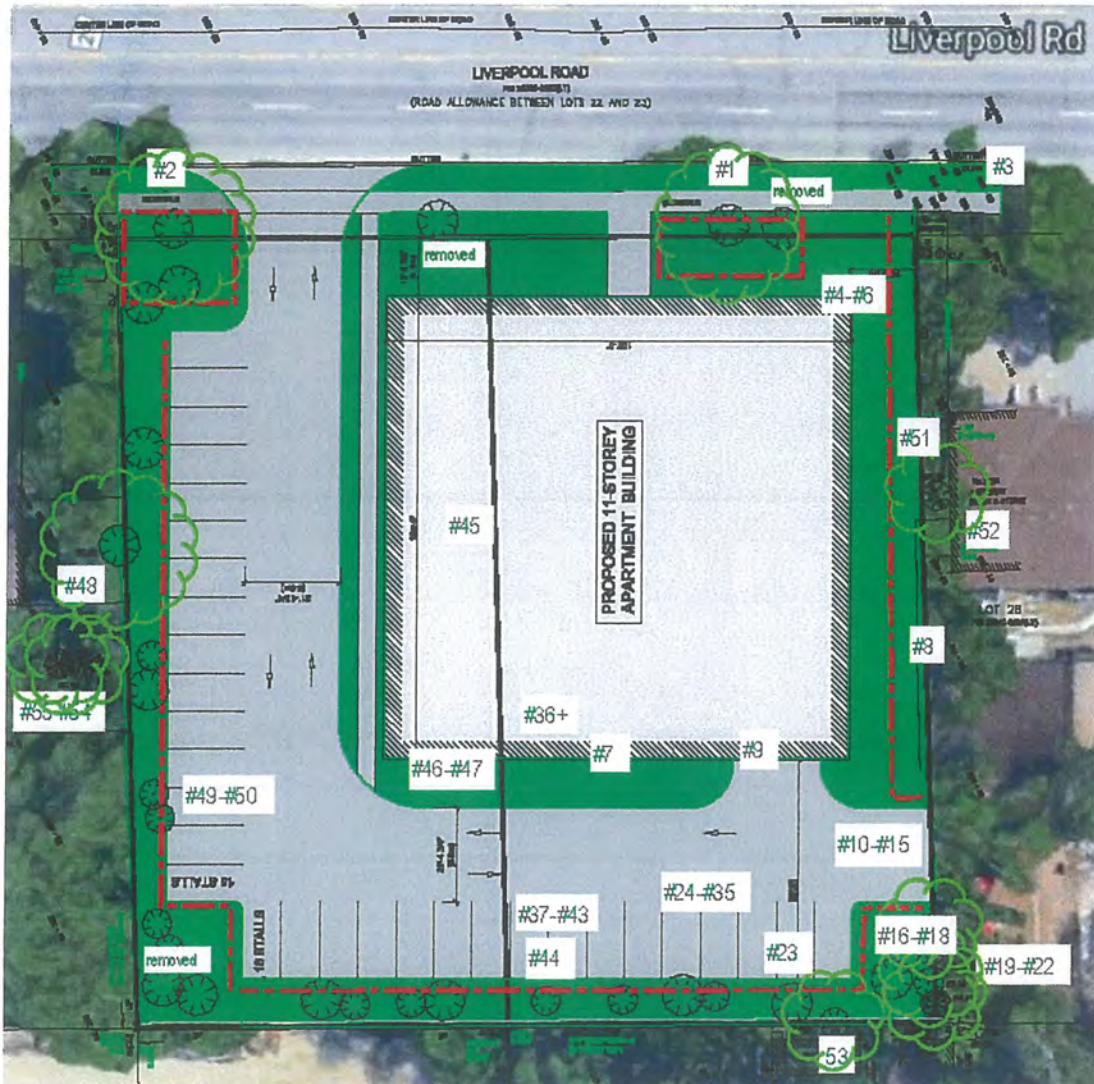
Site Plan Proposal for the 1854 and 1858 Liverpool Road site. Trees are numbered, and tree protection barriers (red) are indicated.
